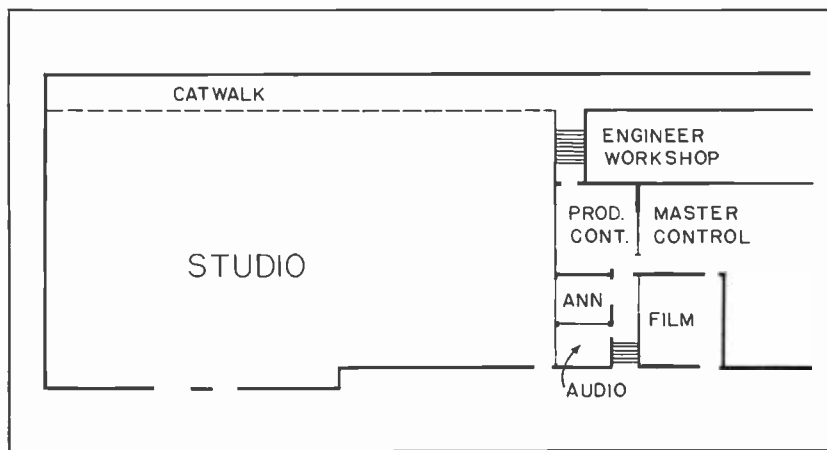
First floor plan of WWL-TV studio building, showing how the technical facilities are arranged. Note that Production Control and Master Control are separated. This gives the technical personnel an area of their own in which to operate, without distraction. Likewise, the director, agency, and client can have privacy in their own area. Also, video and audio engineers are separated. The Announcer is located between Production Control and Audio. The Film room is directly behind Audio and Announcer. Under this arrangement, all can see into the other's area, and all can see into the studio.
